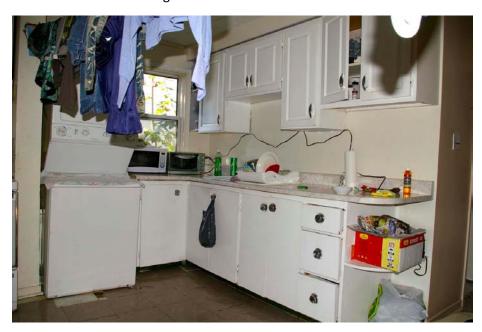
Kitchen looking towards the window on the south-west facing side wall, with wood cabinetry that appears to be original (with a more recent countertop).
